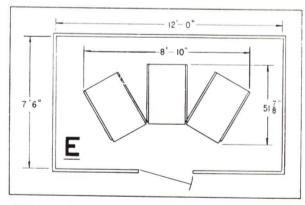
FIG. E: Here is something different in 5 KW floor arrangements. Only Gates design permits a semi-horseshoe floor plan. Only Gates has independent cubicle design where cooling and electrical construction is complete in each cabinet or cubicle and wire jumpers between cubicles is the only necessity for complete operation.
